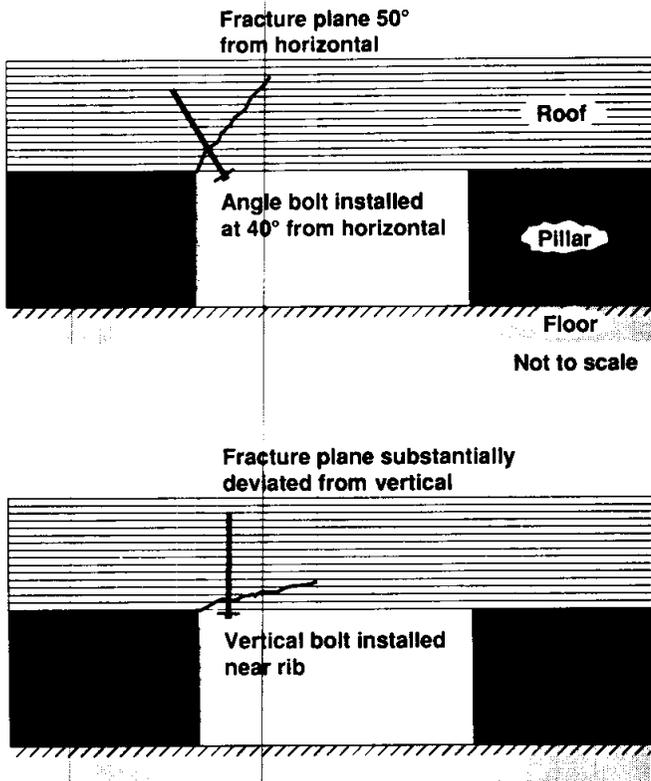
Relationship between angle of cutter failure plane and installation angle of rock bolts.
